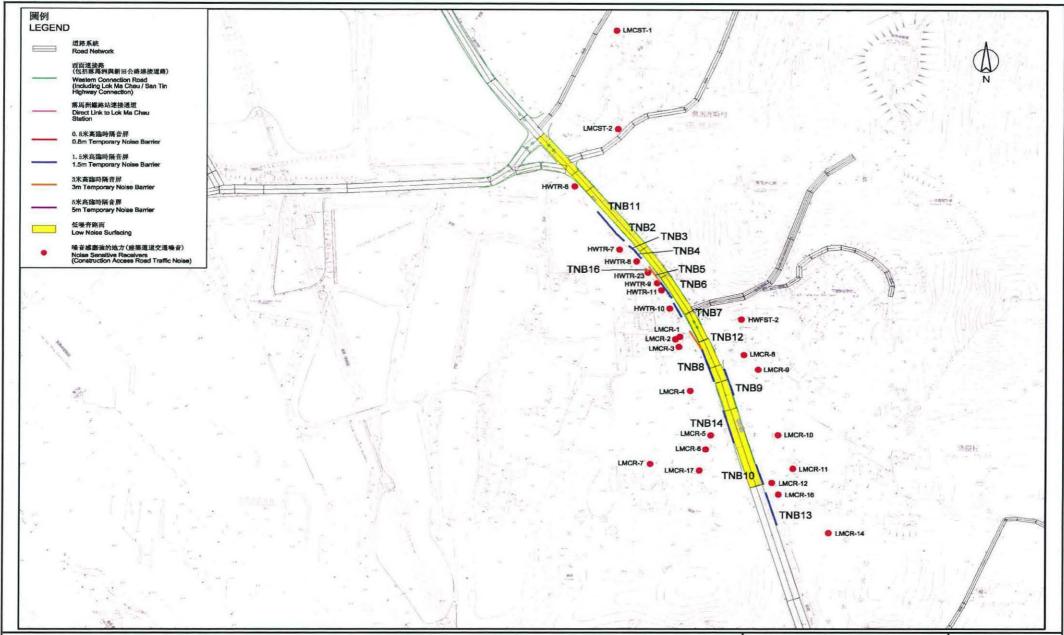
Extents and Locations of Construction Stage Temporary Noise Barriers Before the Commencement of Road Widening Works of the Western Connection Road at the Existing Lok Ma Chau Road (Sheet 2 of 2)
